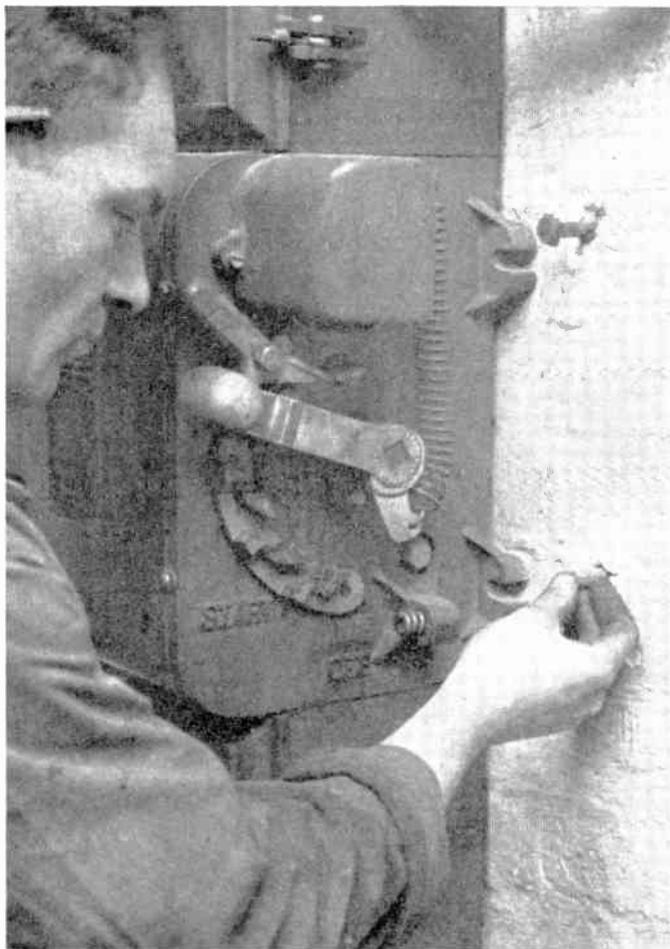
FIXING HEAVY SWITCHGEAR TO BRICK WALLS. THE SECOND OPERATION.
